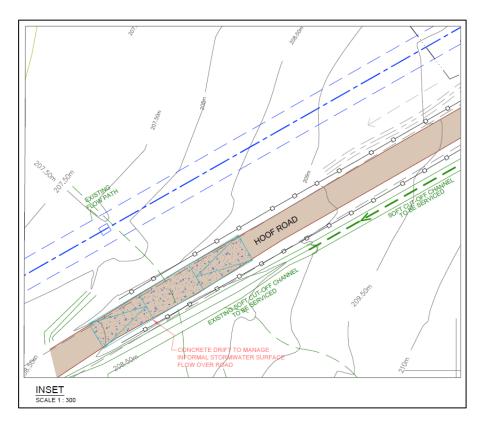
Proposed concrete drift on Hoof Pad, due to seasonal inundation of this section of road.
